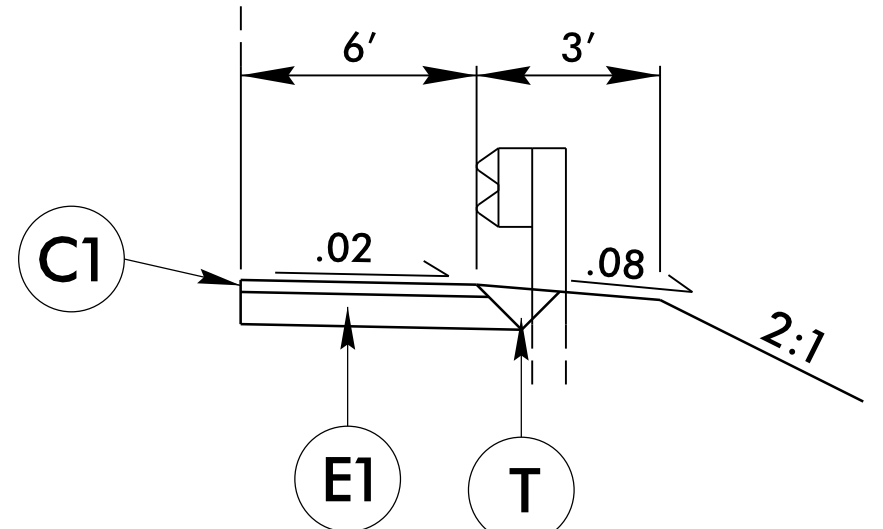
DETAIL SHOWING SHOULDER BERM GUTTER (SBG) ON TOP OF SUBGRADE
